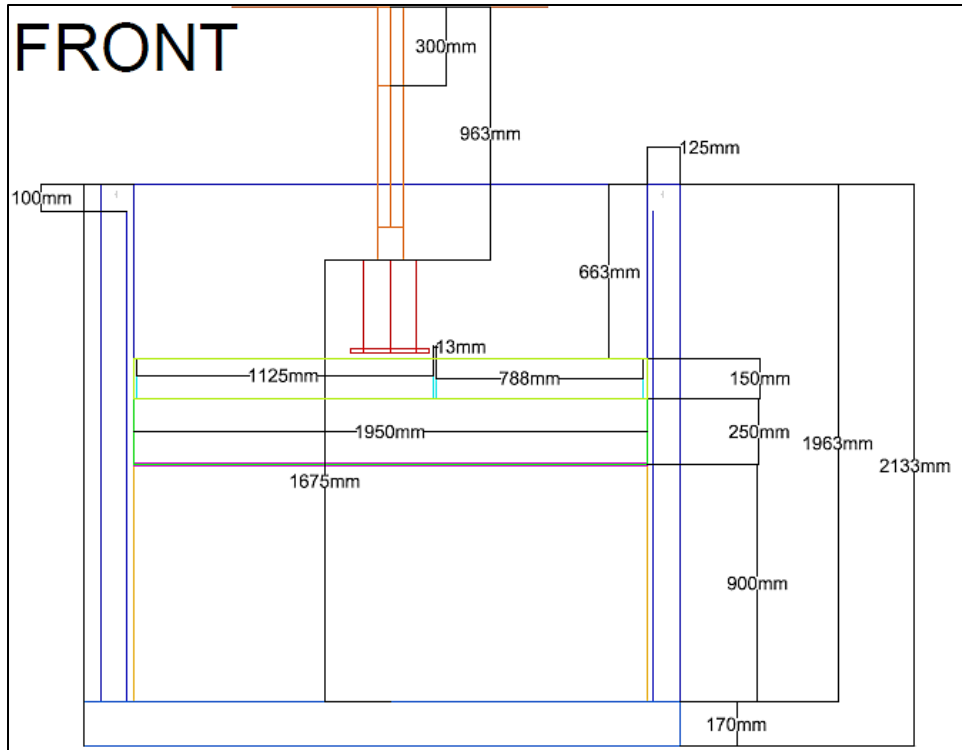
Big Box Layout with Concrete Slabs, Front View.
